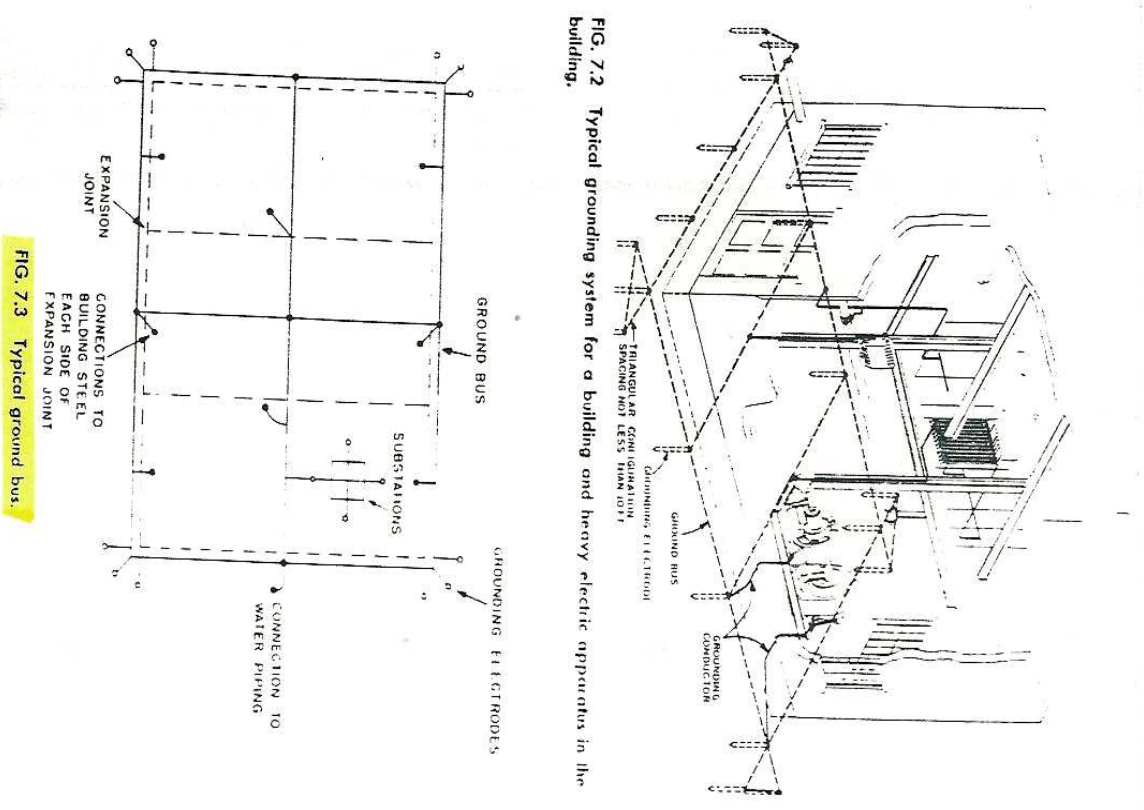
Typical grounding system for a building and heavy electric apparatus in the building.
